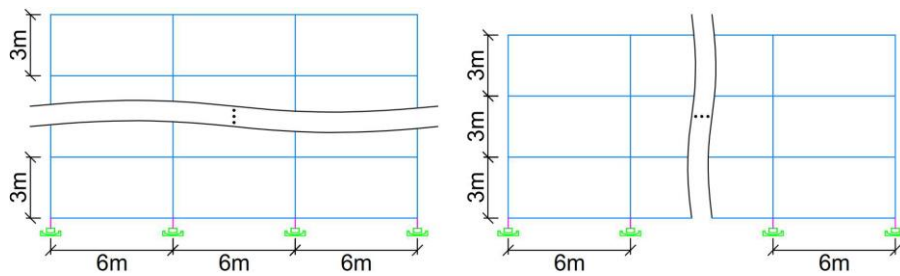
Selected Buildings Floors and Bays Dimensions
